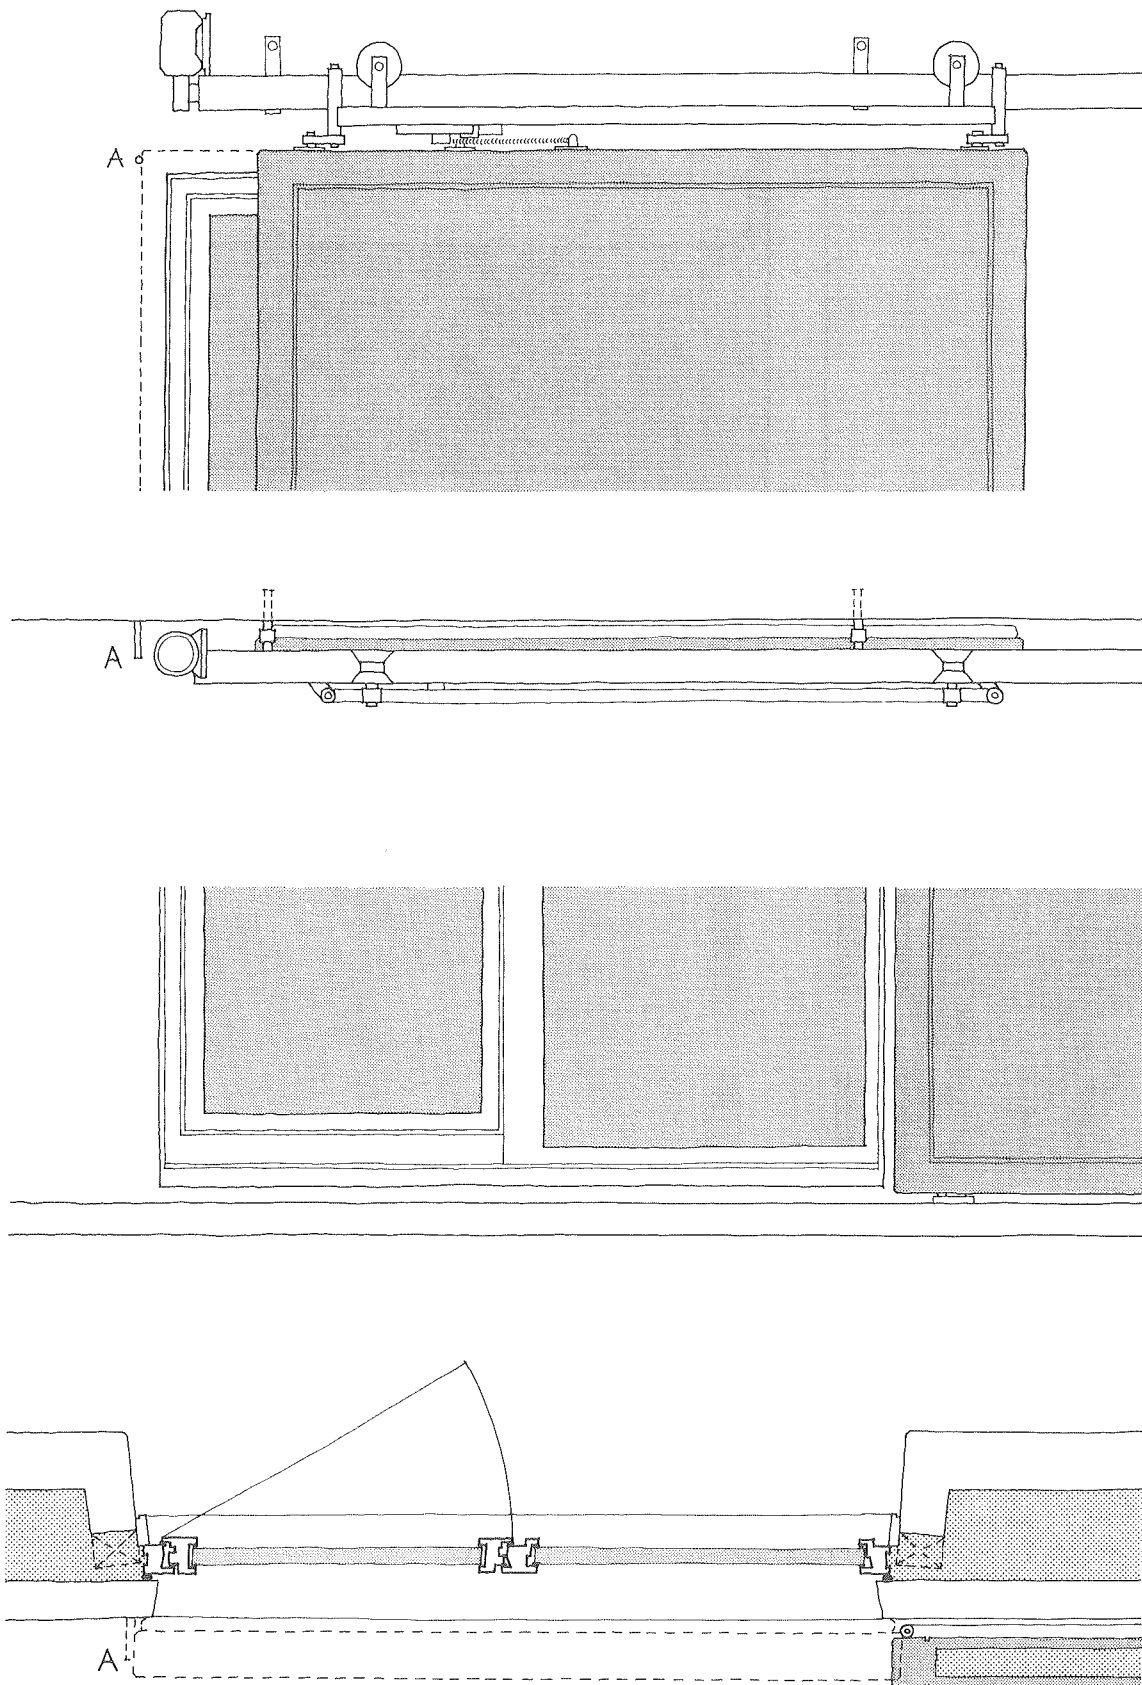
House F. South facing French window with external horizontally sliding shutter.
